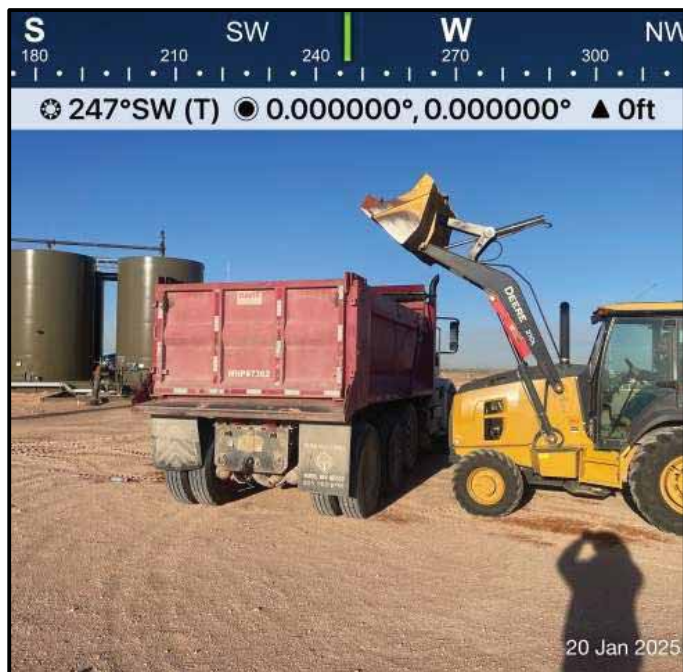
Waste soil was routinely loaded into dump trucks and hauled offsite for disposal at Lea Land, LLC as remediation activities were being performed..
